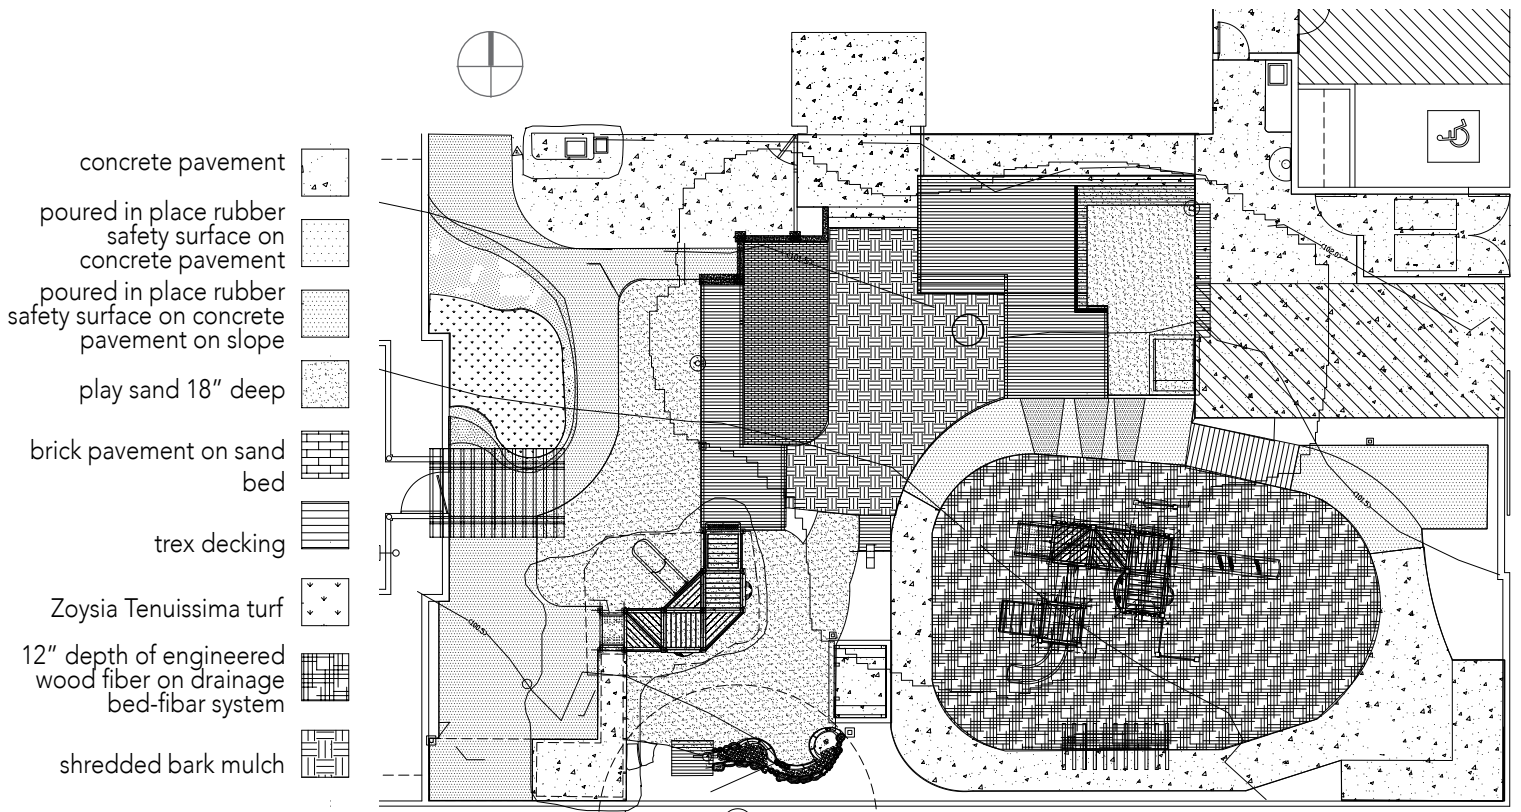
Outdoor Garden Plan Diagram; Source: Swire Siegel Landscape Architects
